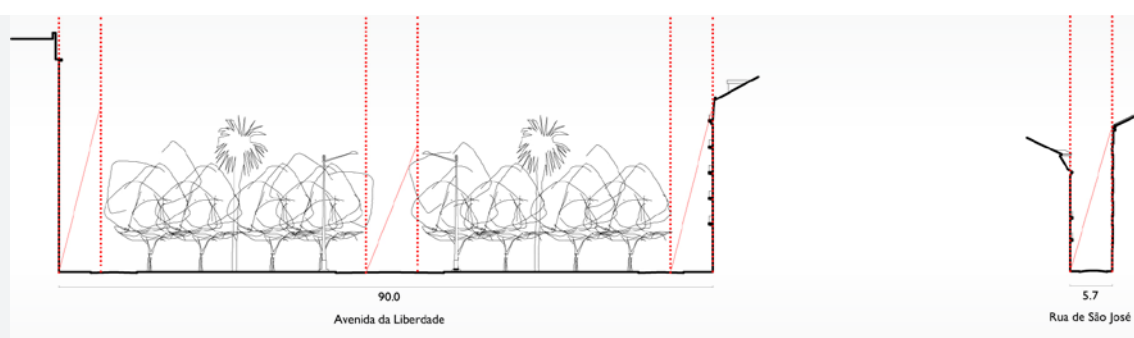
Street cross-sections of Avenida da Liberdade and Rua de São José.
